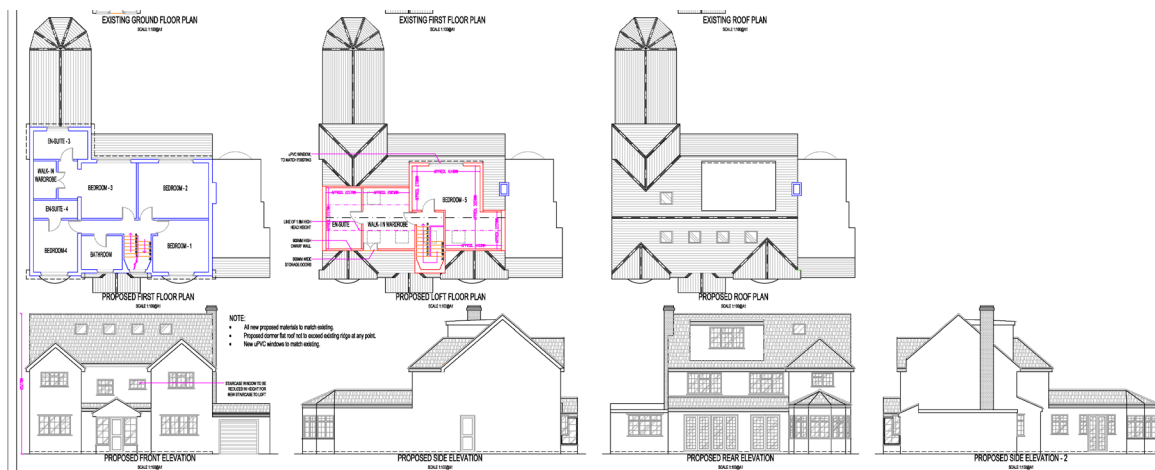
Floor Plans and Elevations 22 Ducks Hill Road (as per planning permission 21983/APP/2019/1290 – Hillingdon Council)
